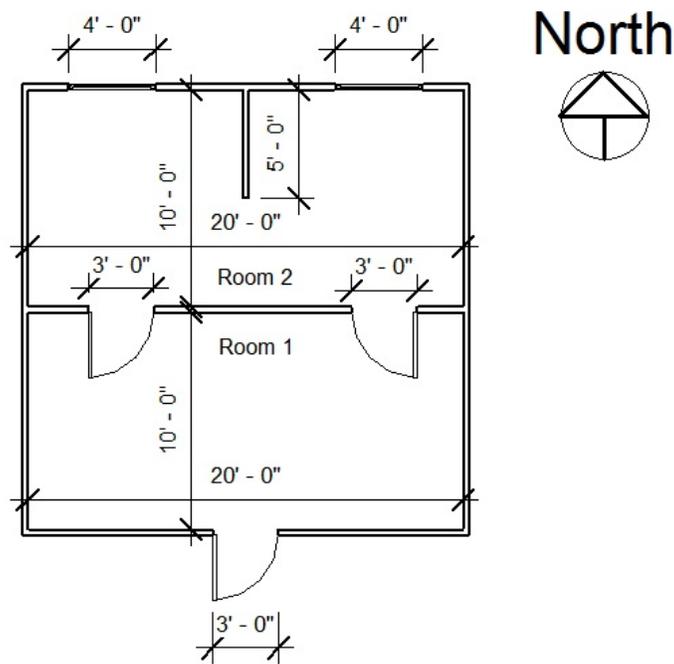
Floor plan of the house used to test the Estimating Tool
